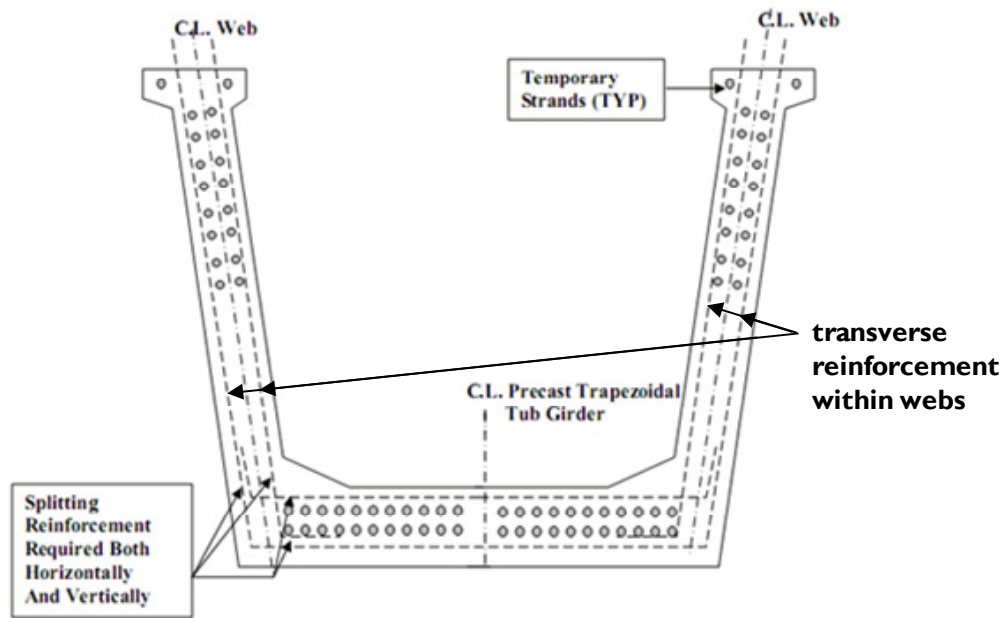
Transverse reinforcement in end region of WSDOT trapezoidal tub girder
